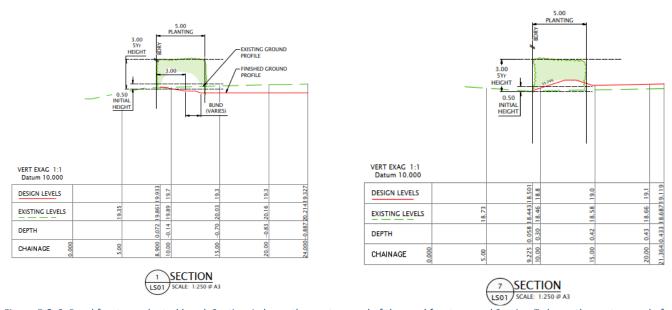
& 6: Road frontage planted bund. Section 1 shows the western end of the road frontage and Section 7 shows the eastern end of the road boundary.
